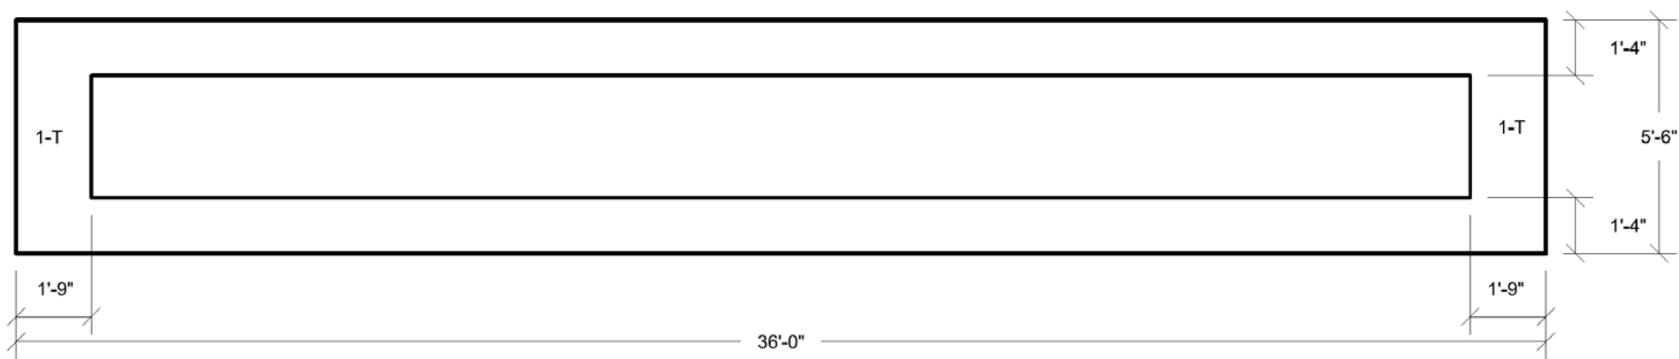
H.7-19A Roof of Tunnel Looking Down Transverse Reinforcement Zones
